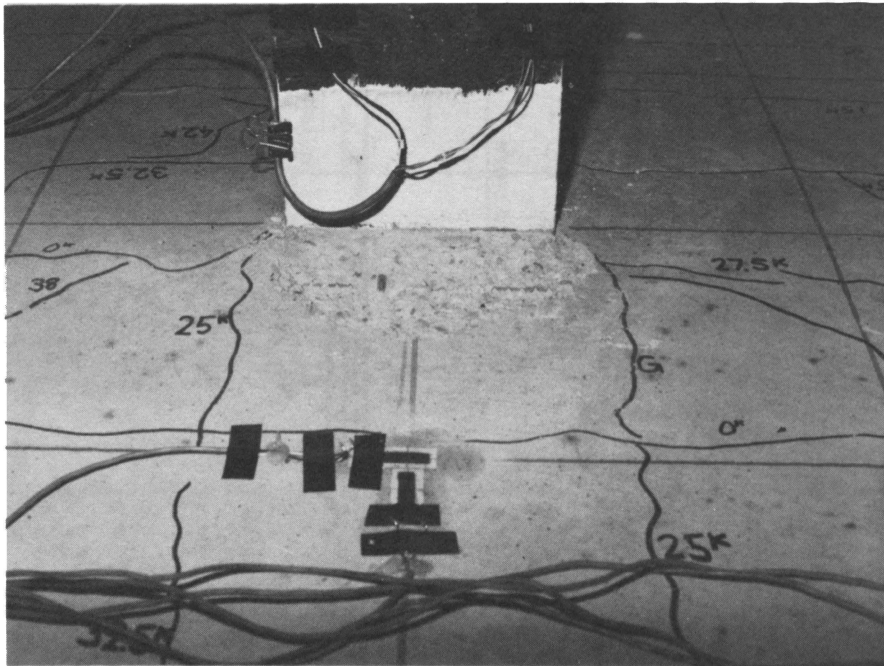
Failure Surface on Leeward Side of Center Column of CA-1
